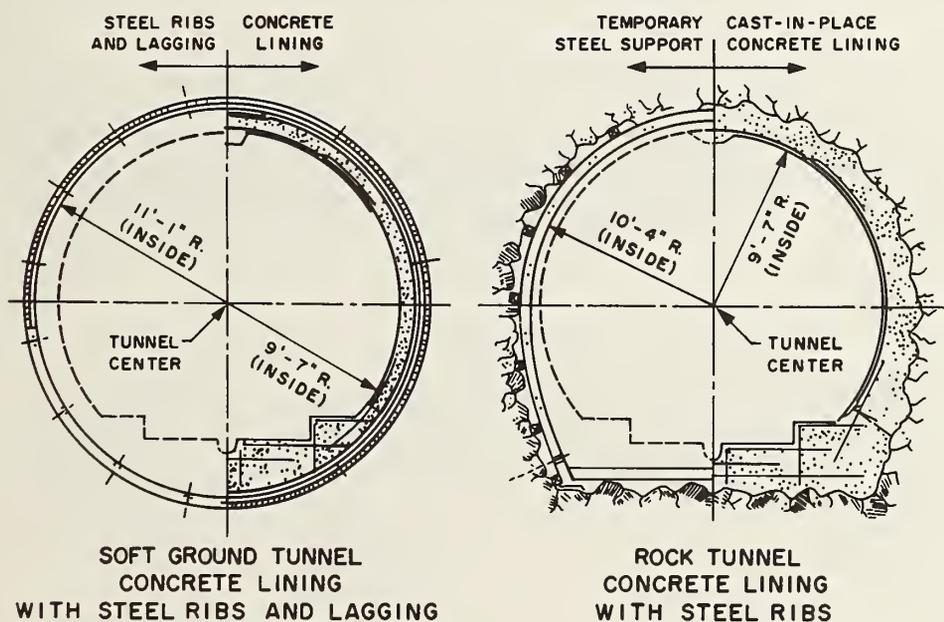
TYPICAL RED LINE TUNNEL SECTIONS
